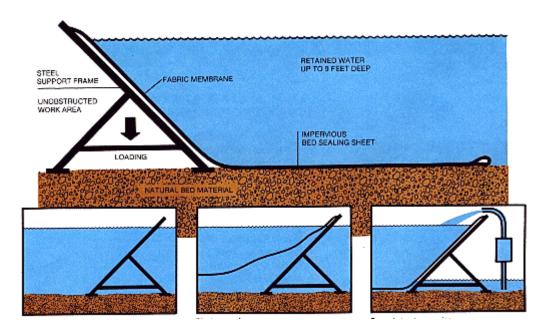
PORTADAM: THE STRUCTURE (ABOVE) AND INSTALLATION INTO THE STATIC WATER (BELOW)
